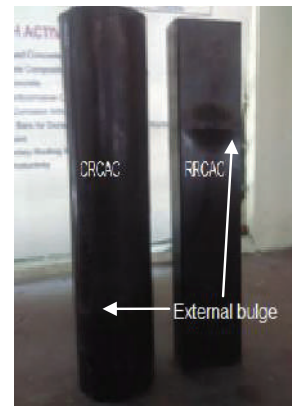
(b): External buckling in RCA concrete-filled columns.
